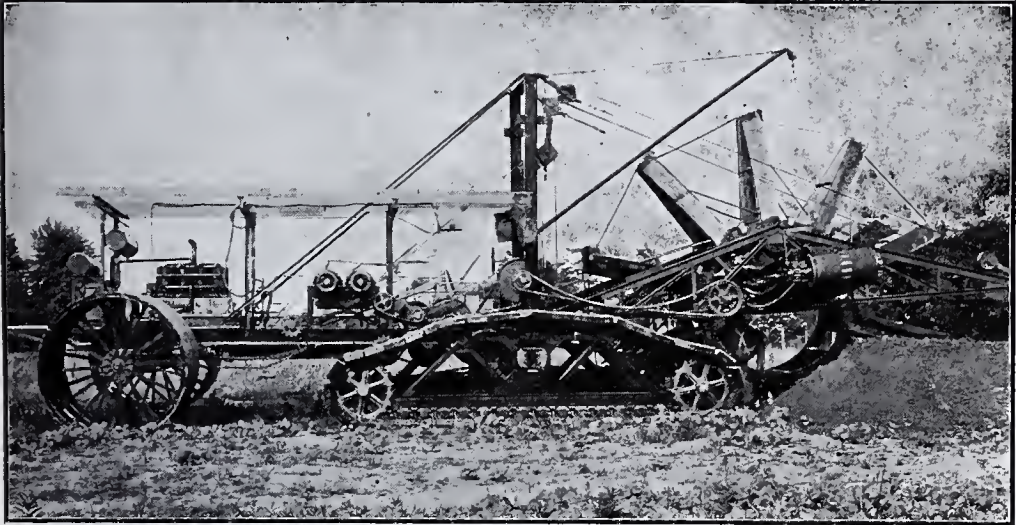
Excavator for open ditches, cutting ditch 5 feet wide and 6 feet deep, with sloping sides.
